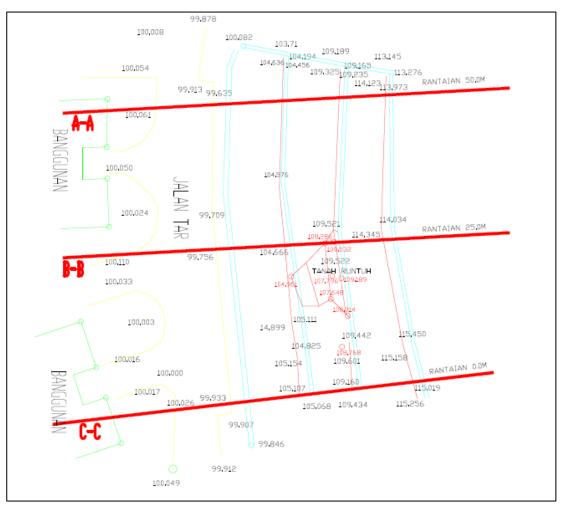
Survey Plan View of the Block 14 Slope Failure
